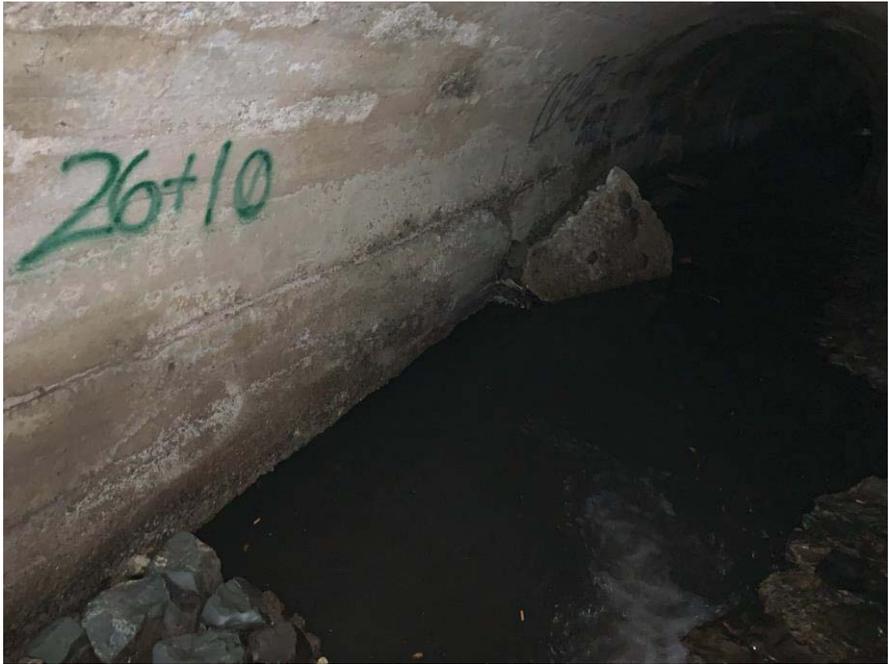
Section 9 – Floor Failure (STA26+10)
